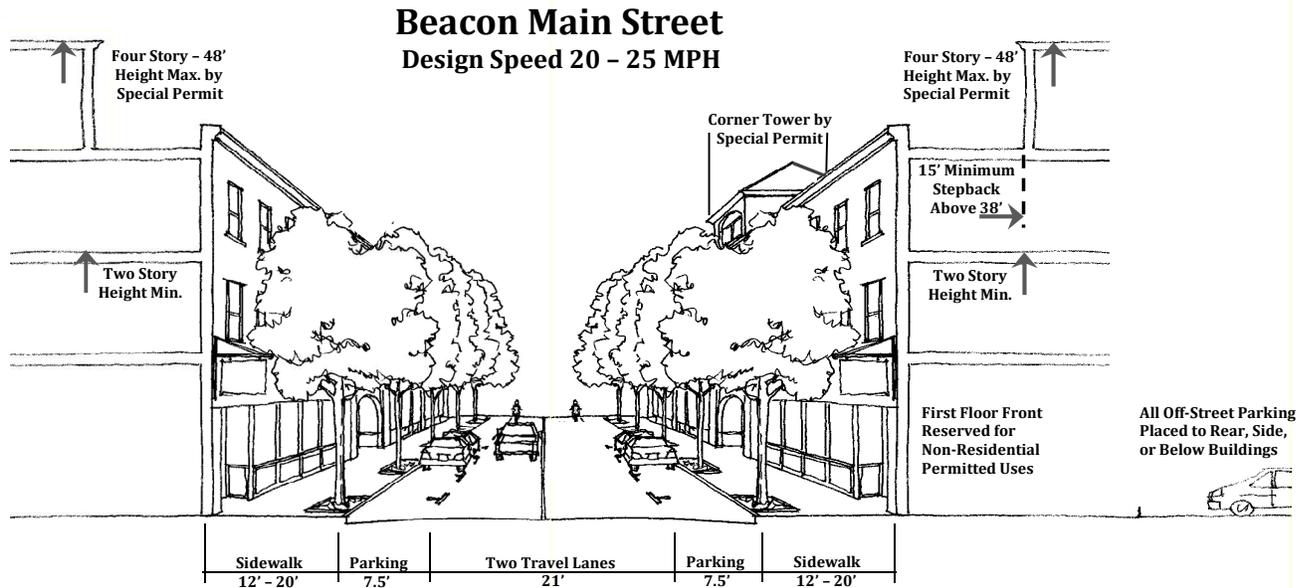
Central Main Street Zoning Requirements Illustrative View
